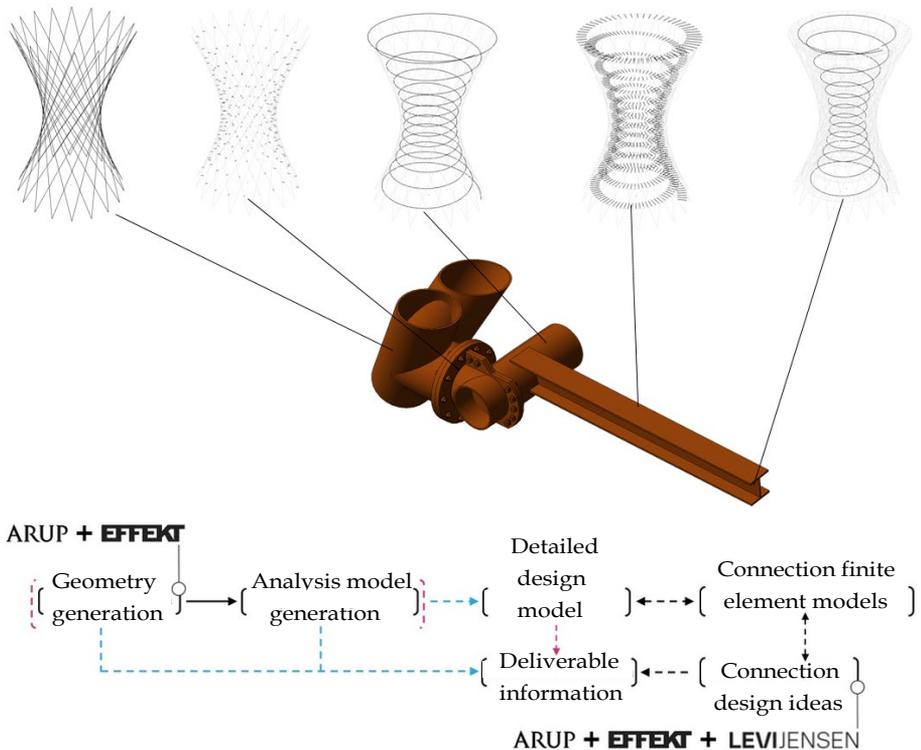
Parametric workflow developed for Camp Adventure Tower (© Arup)
